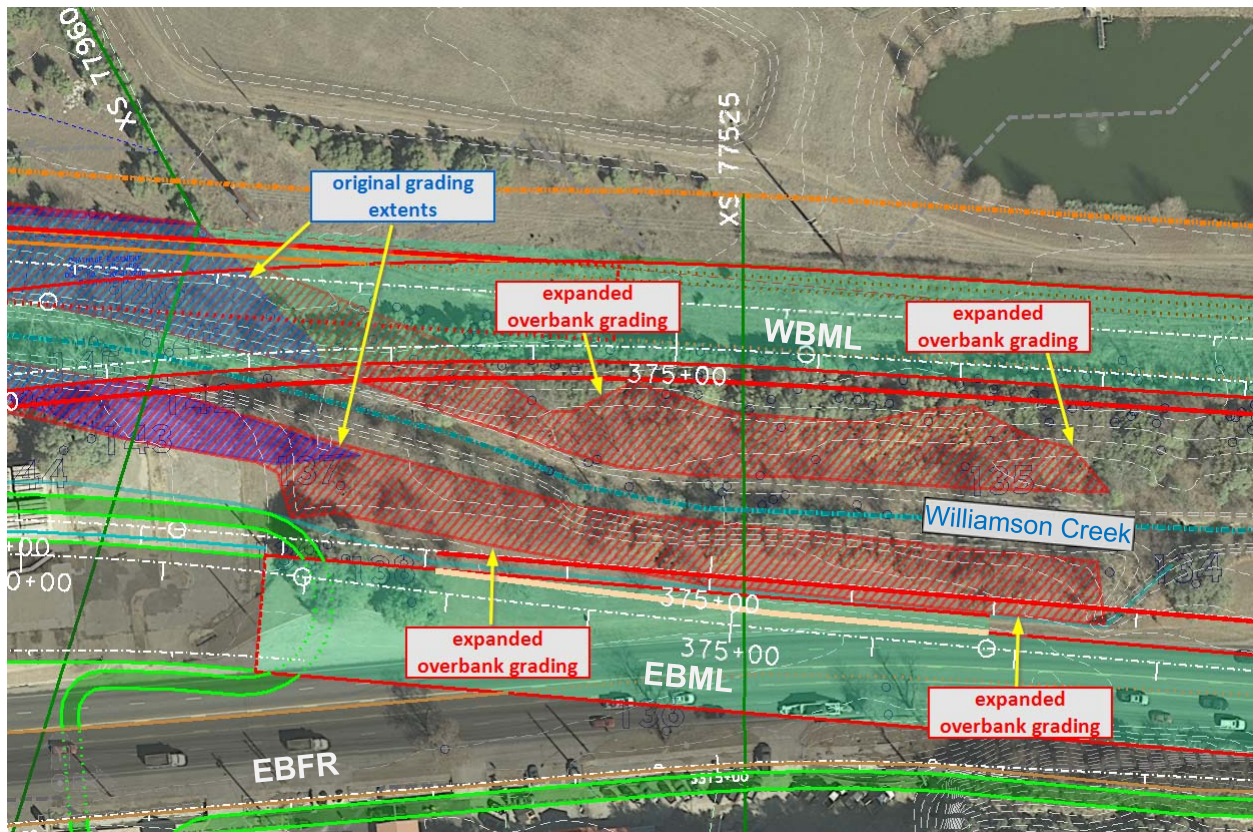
Additional Overbank Grading Upstream of William Cannon Bridge
